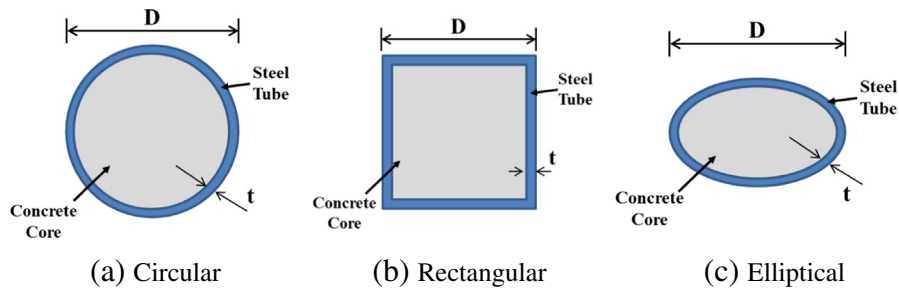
Typical concrete-filled-tubular (CFT) columns with normal-size sections.
